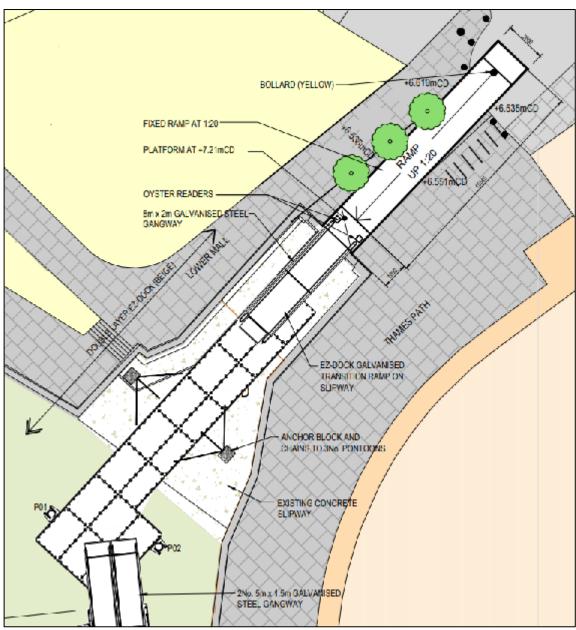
Proposed Plan for Temporary Hammersmith Pier
